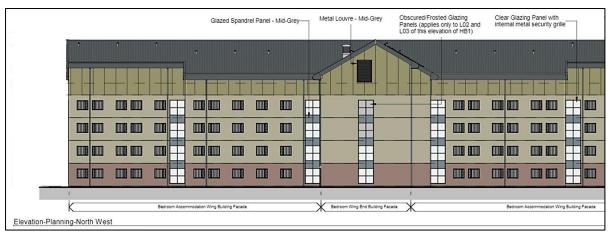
Extract of amended elevational treatment for Houseblock 1 indicating provision of obscure glass to landing windows at second and third floor levels
